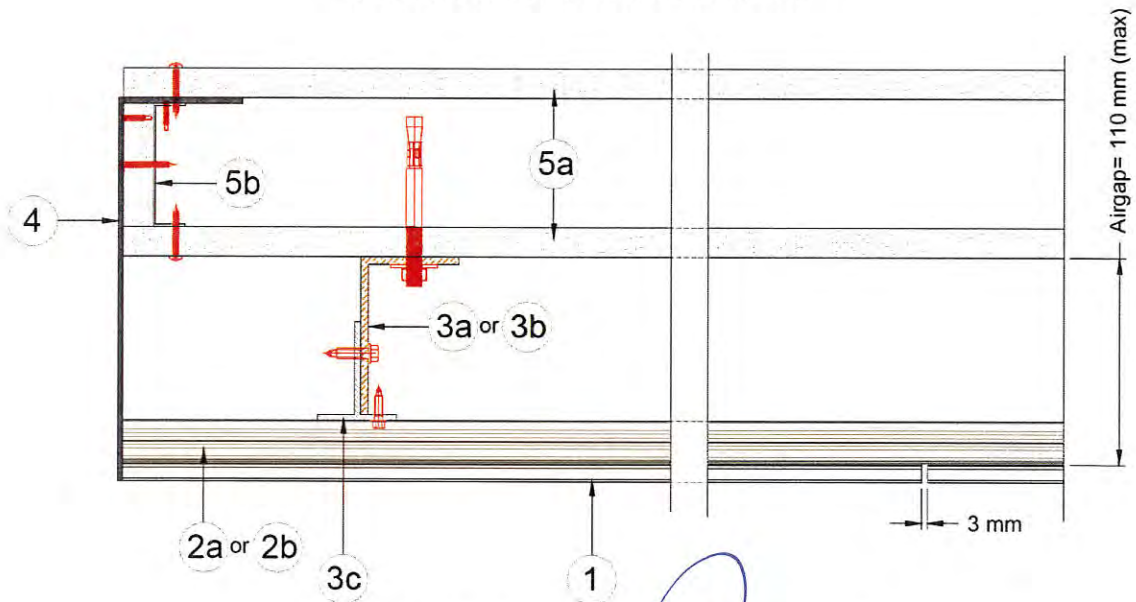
Non-load-bearing exterior wall cladding assembly typical horizontal joint and window section details
